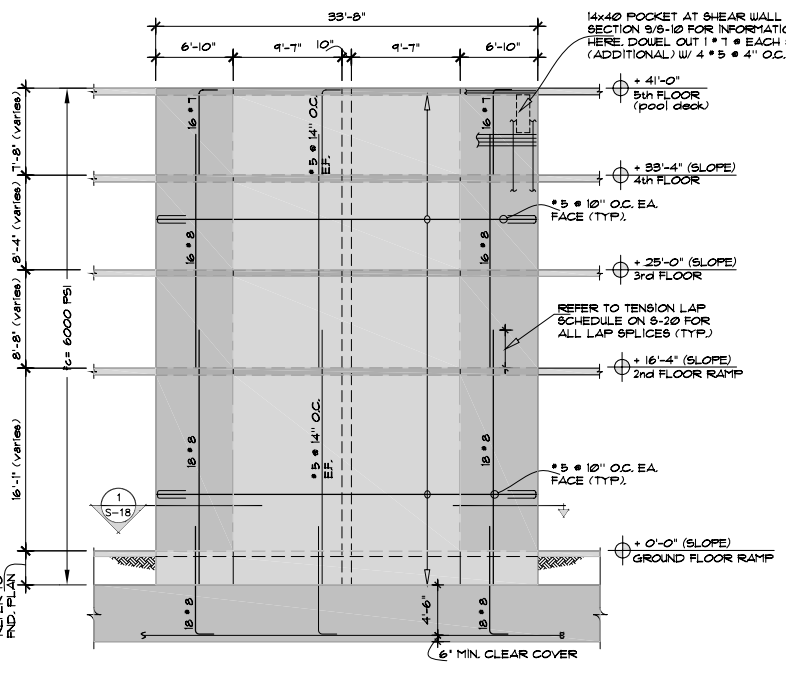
DETAIL FOR TERMINATING SHEAR WALL REINFORCING
